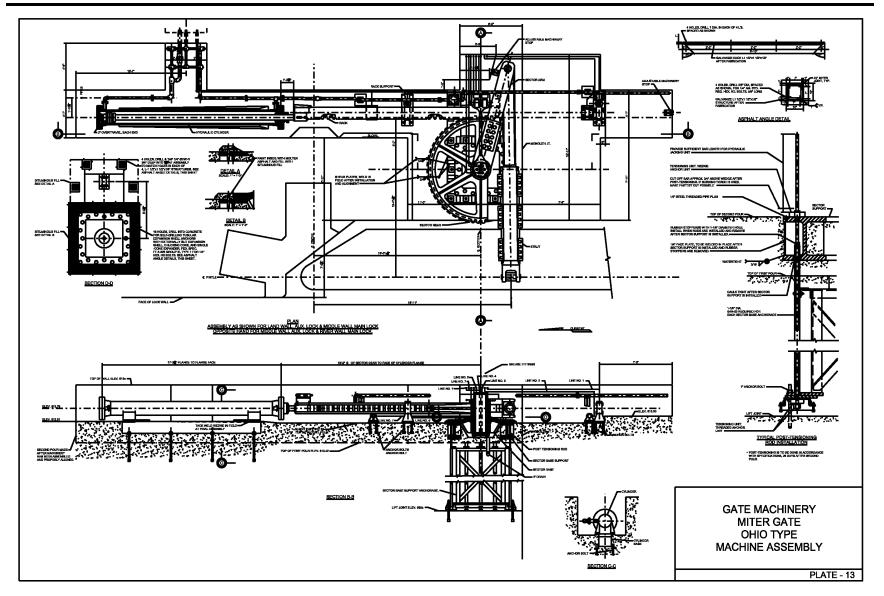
Plate 13: Gate machinery miter gate, Ohio type machine assembly
